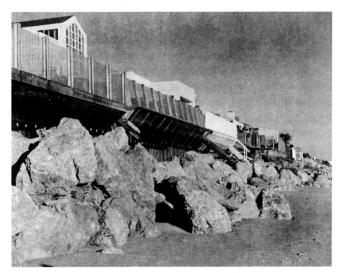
Photo of Malibu Beach showing sand loss and widespread damages to beach access stairs, windscreens and patios. Rock rip-rap protection was placed after 1982-83 winter storm damage.
